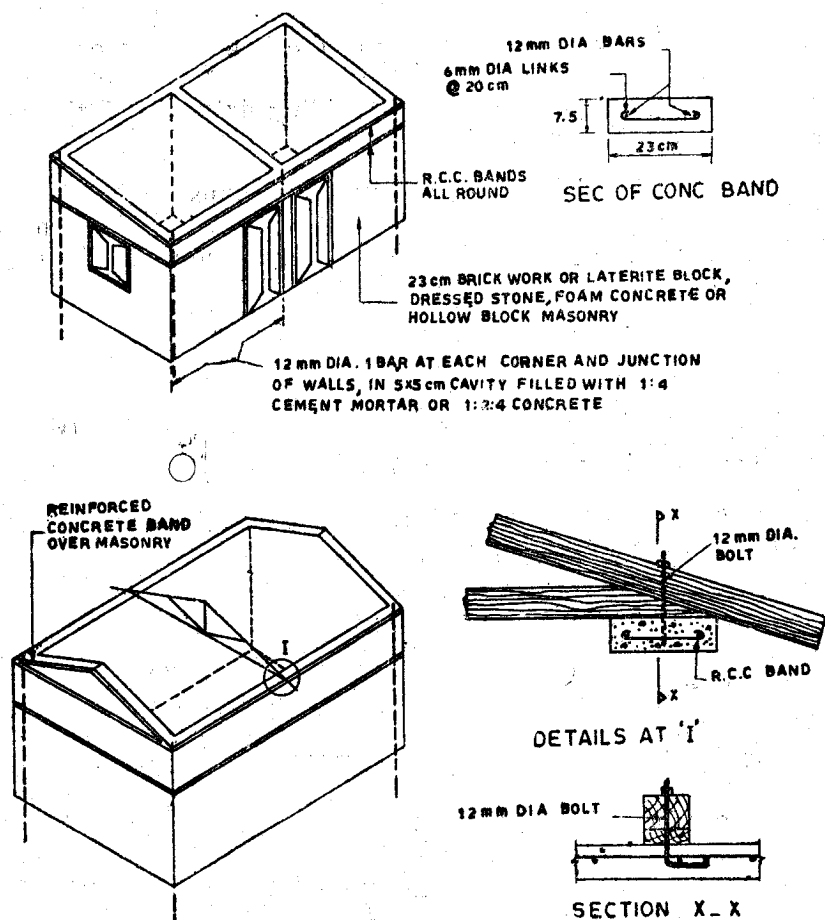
Typical details of masonry construction with band and vertical reinforcement
